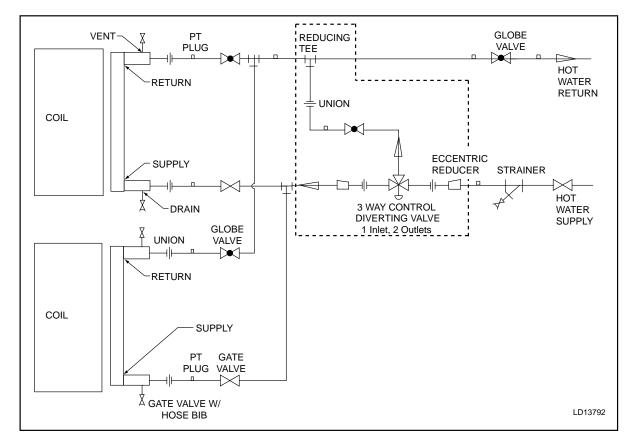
HOT WATER PIPING WITH DIVERTING VALVE Example - NOT for construction
